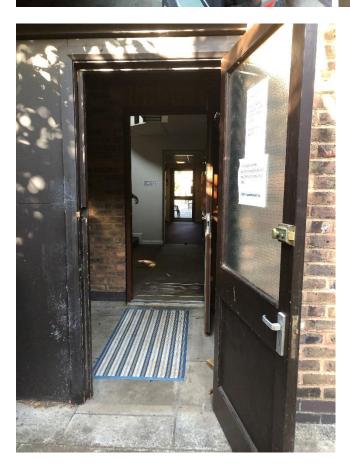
Building 4 images showing under sized store, overspill parking in the escape stair, external door with inappropriate ironmongery
